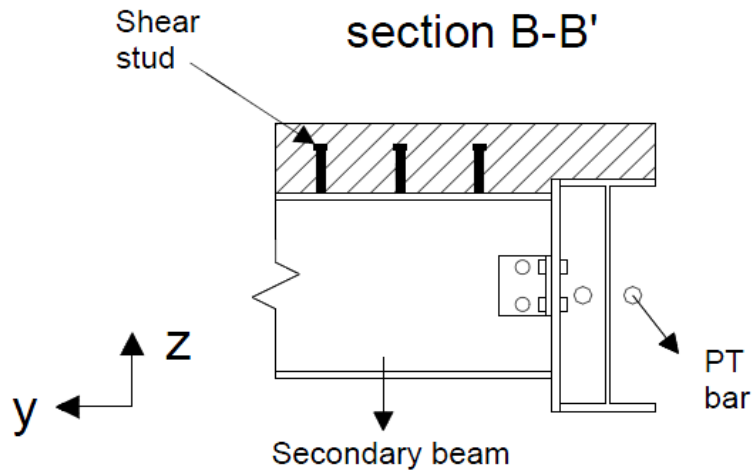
Discontinuous steel-concrete composite slab details (section B-B)
